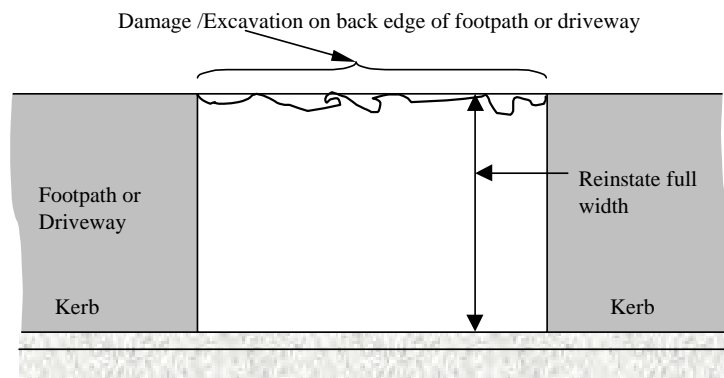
Excavation/Damage on edge of footpath or driveway
